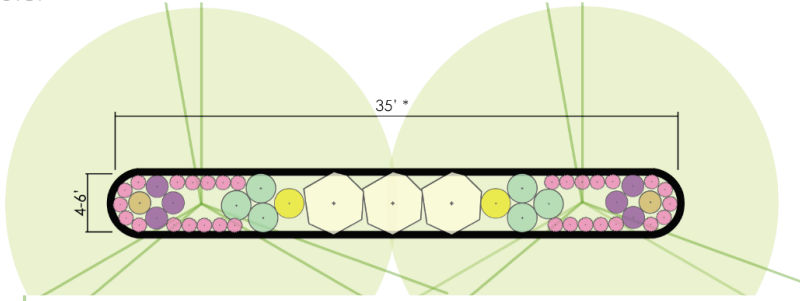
PLANTING BED TYPICAL PLANS
